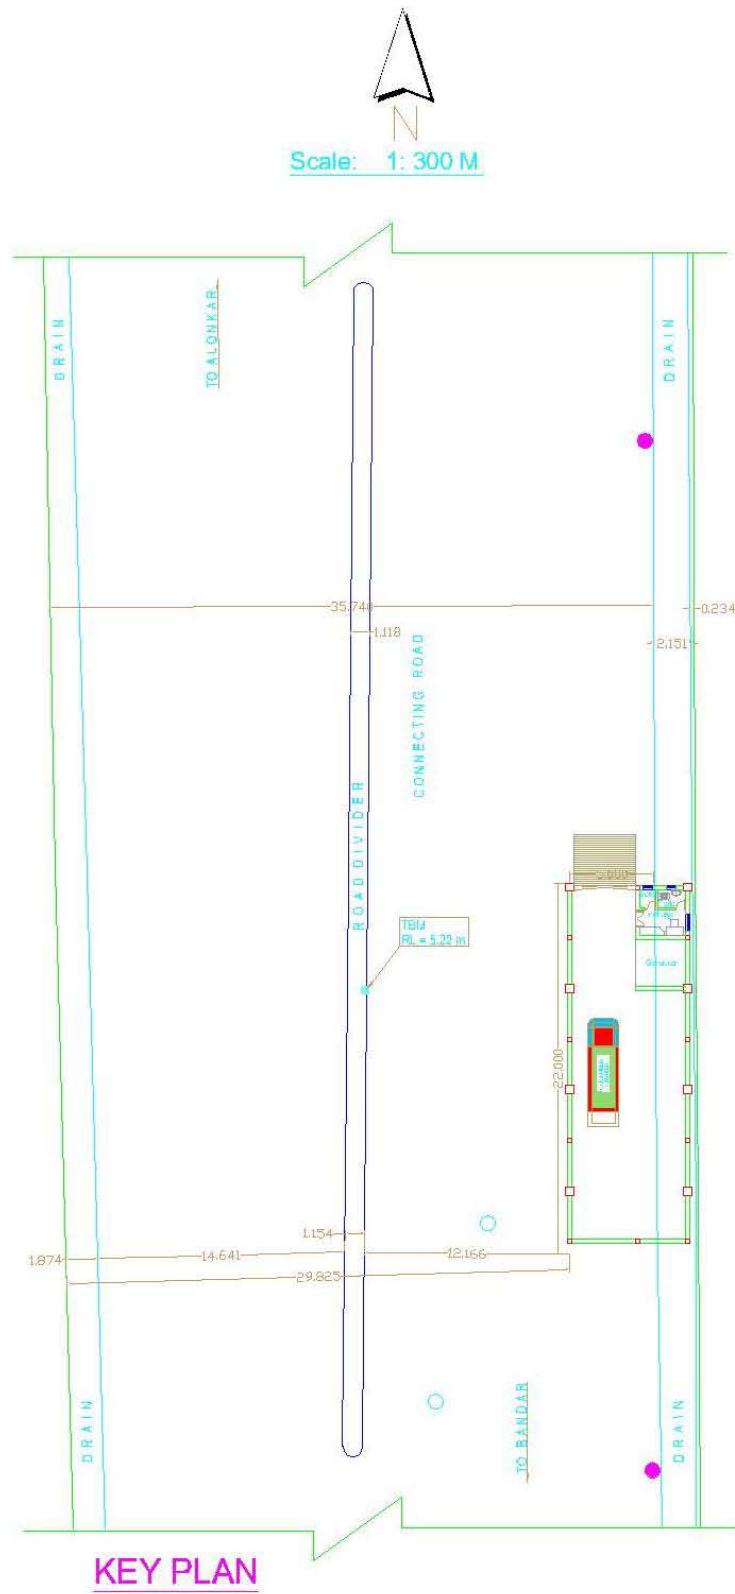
STS – 8 K-Block DT Road Layout Plan (22°20'35"N, 91°48'11"E)
